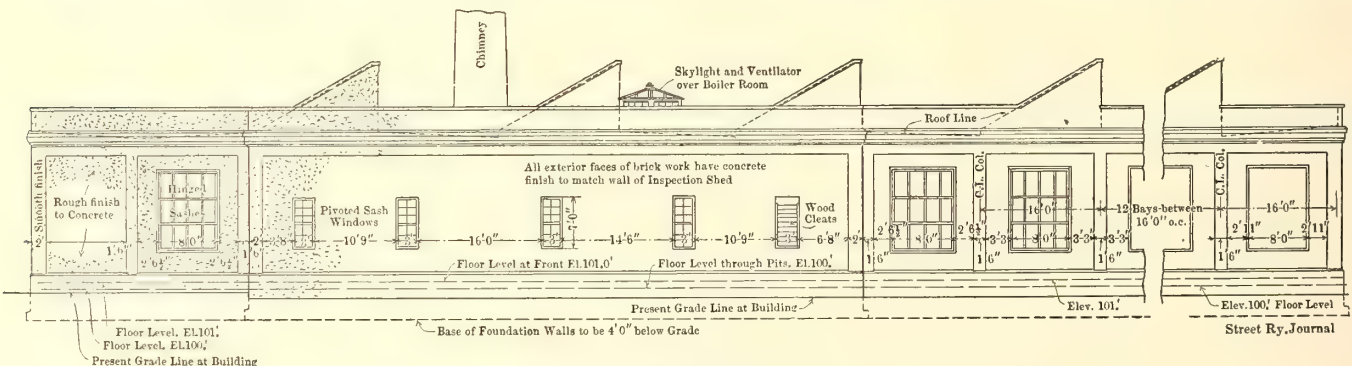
SIDE ELEVATION, LOOKING TOWARD THE BOILER HOUSE
